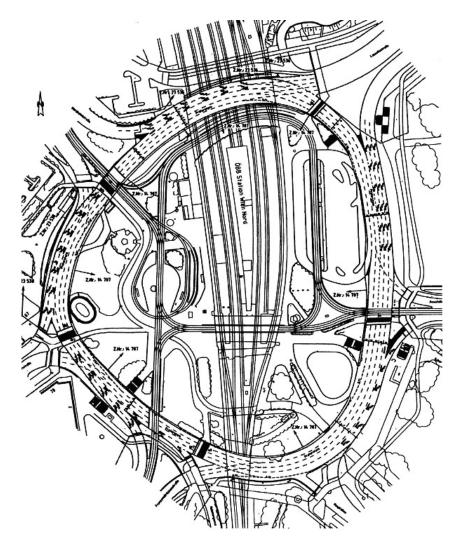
View and general site plan of Roundabout with traffic control in Vienna
